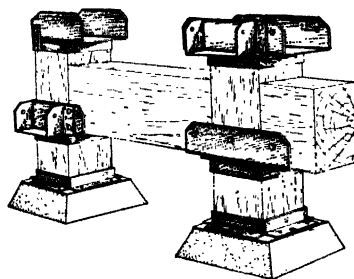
Typical details of construction with "Falls" post caps and bases.
